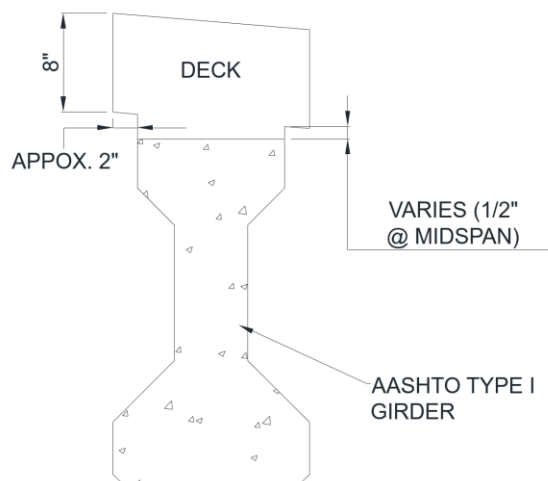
Cross Section of Test Specimens (adapted from INDOT 1987)
